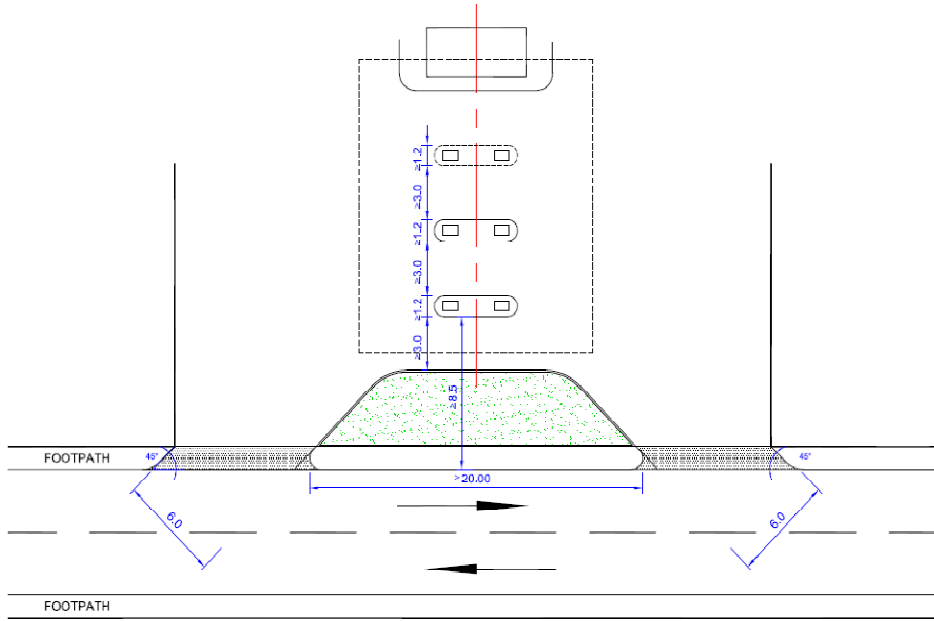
Access Layout for Fuel Stations on Single Carriageways where Right-turn Exit is permitted
